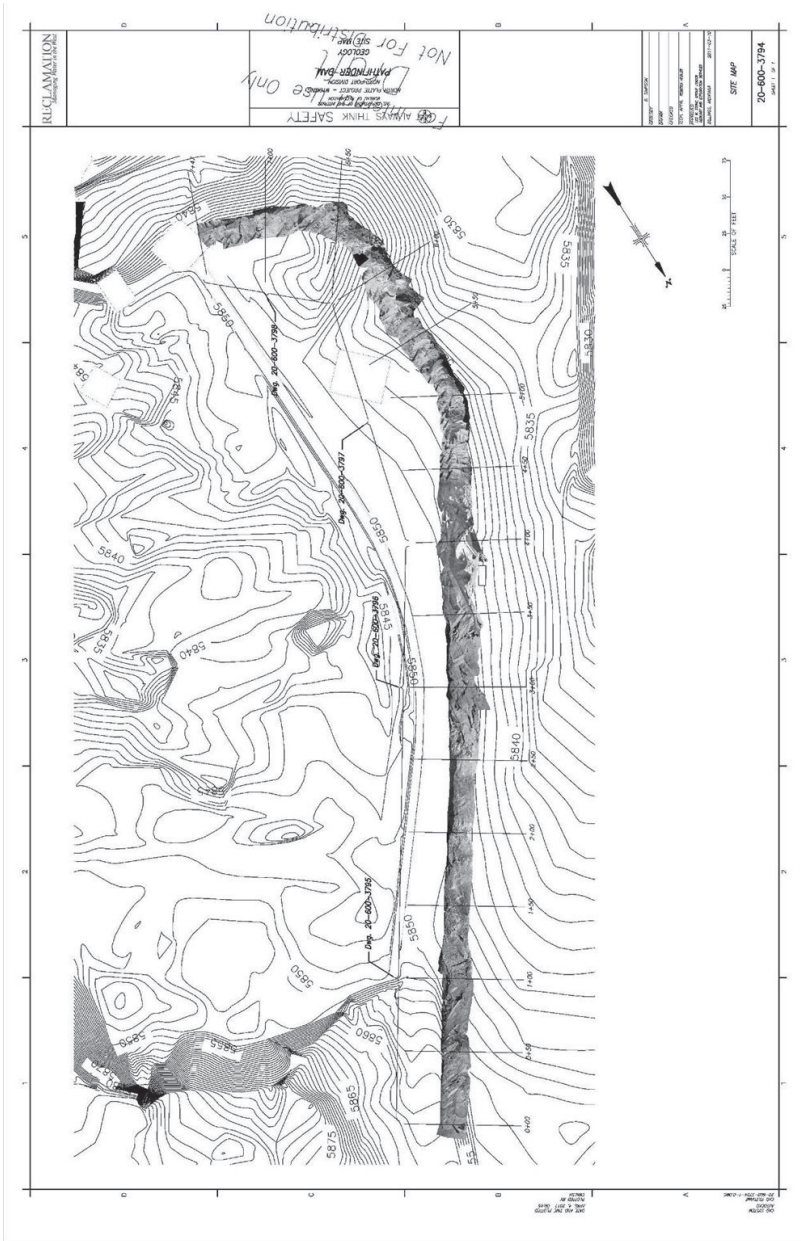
Example of photogrammetric model of the new Pathfinder ogee spillway foundation illustrating the overall orthorectified site plan by station
